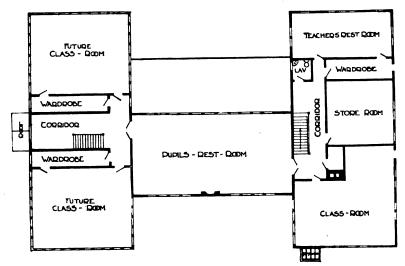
Second-floor plans, Edward Mott Moore Open-air School.
